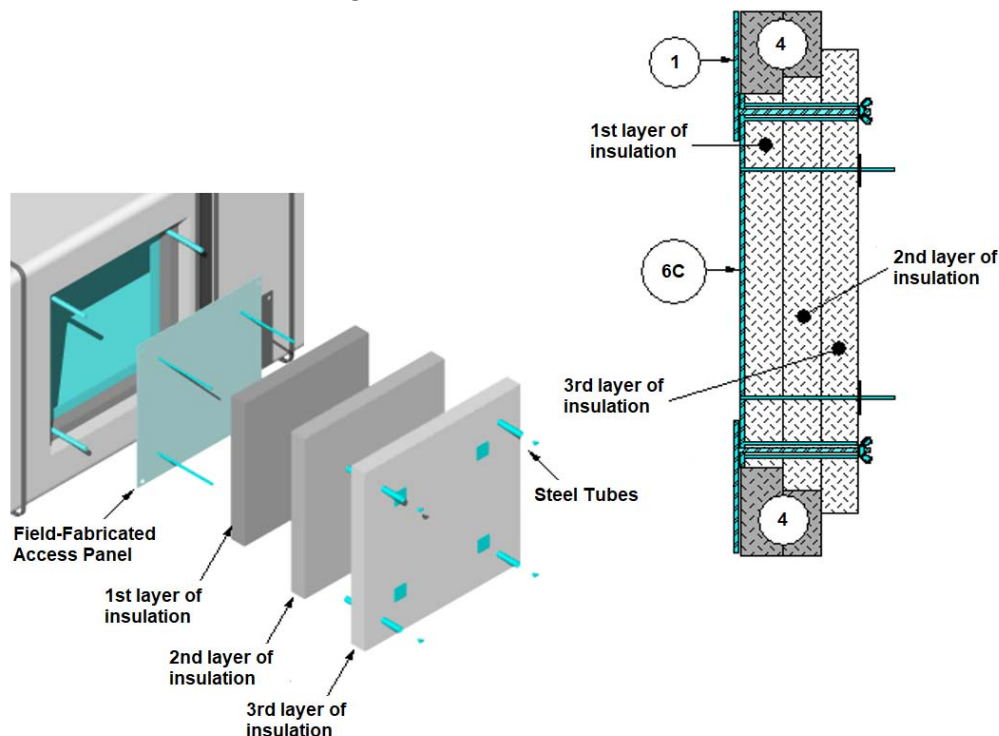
Field-Fabricated Access Door Without Cover Plate
